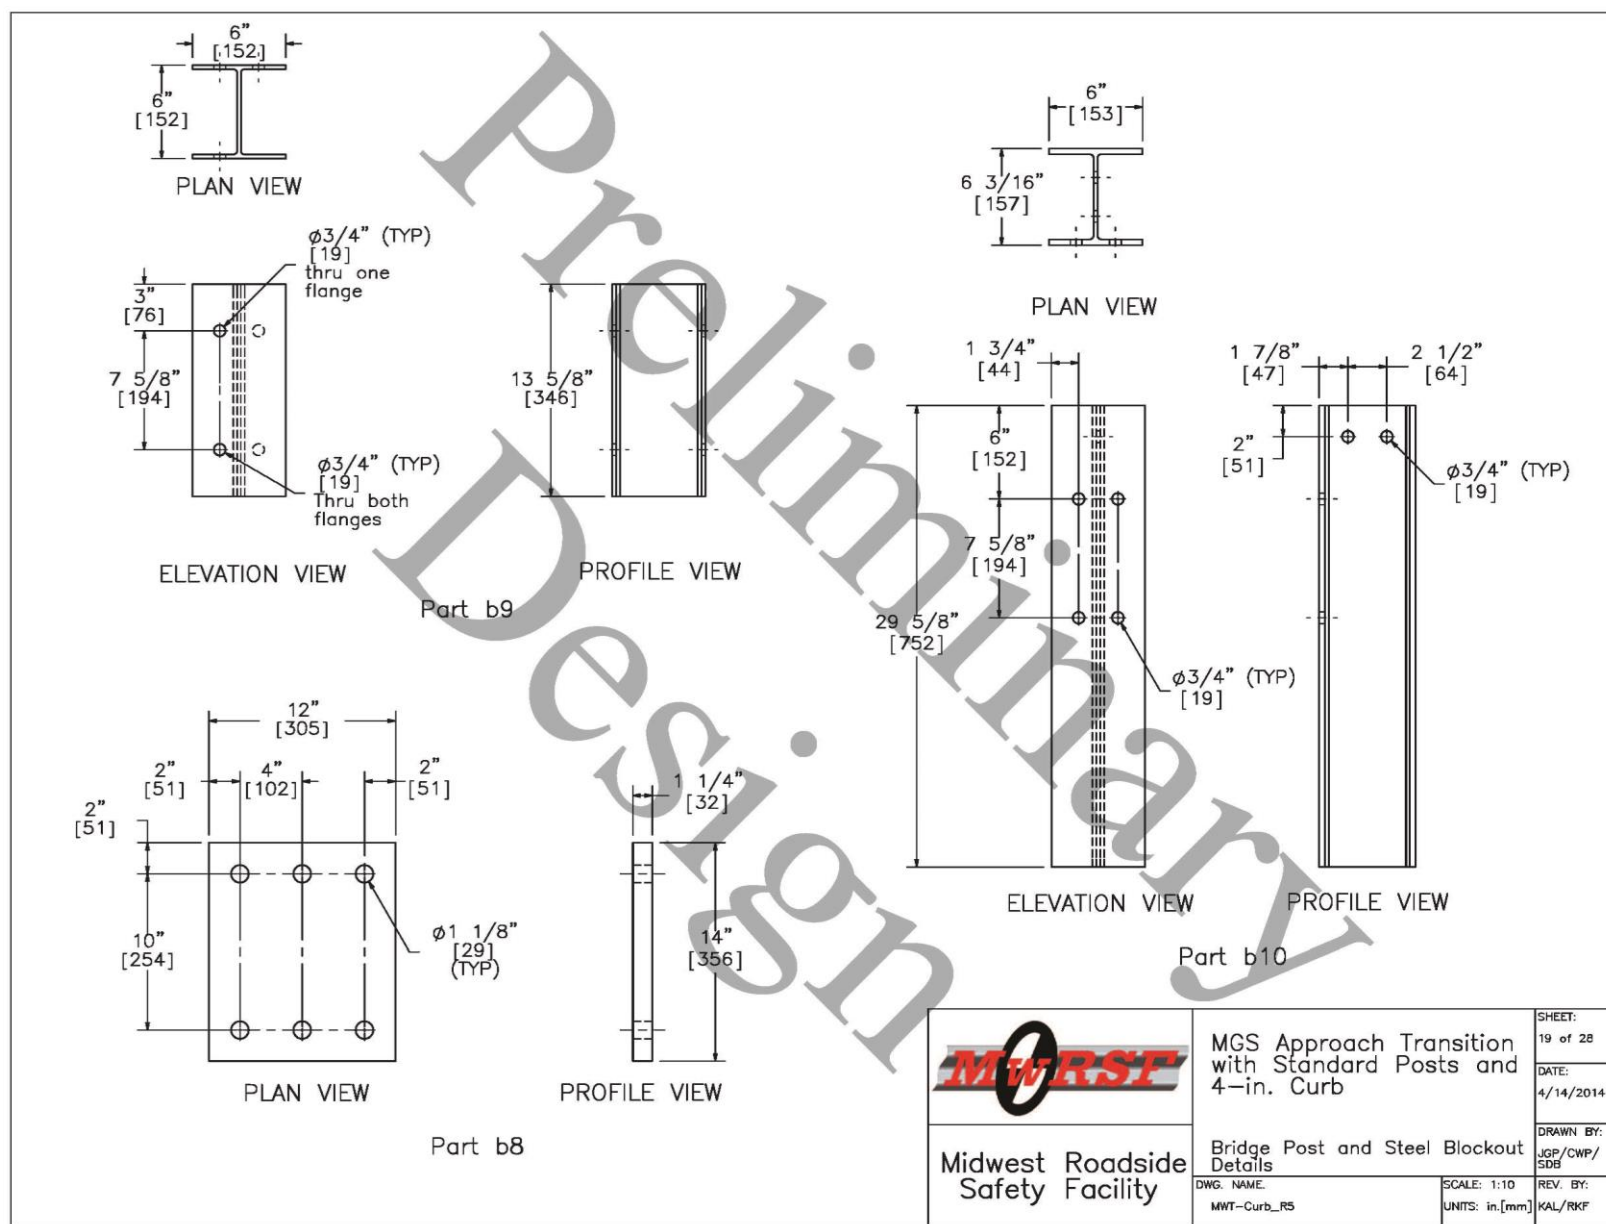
Bridge Post and Steel Blockout Details, Test No. MWTC-1
